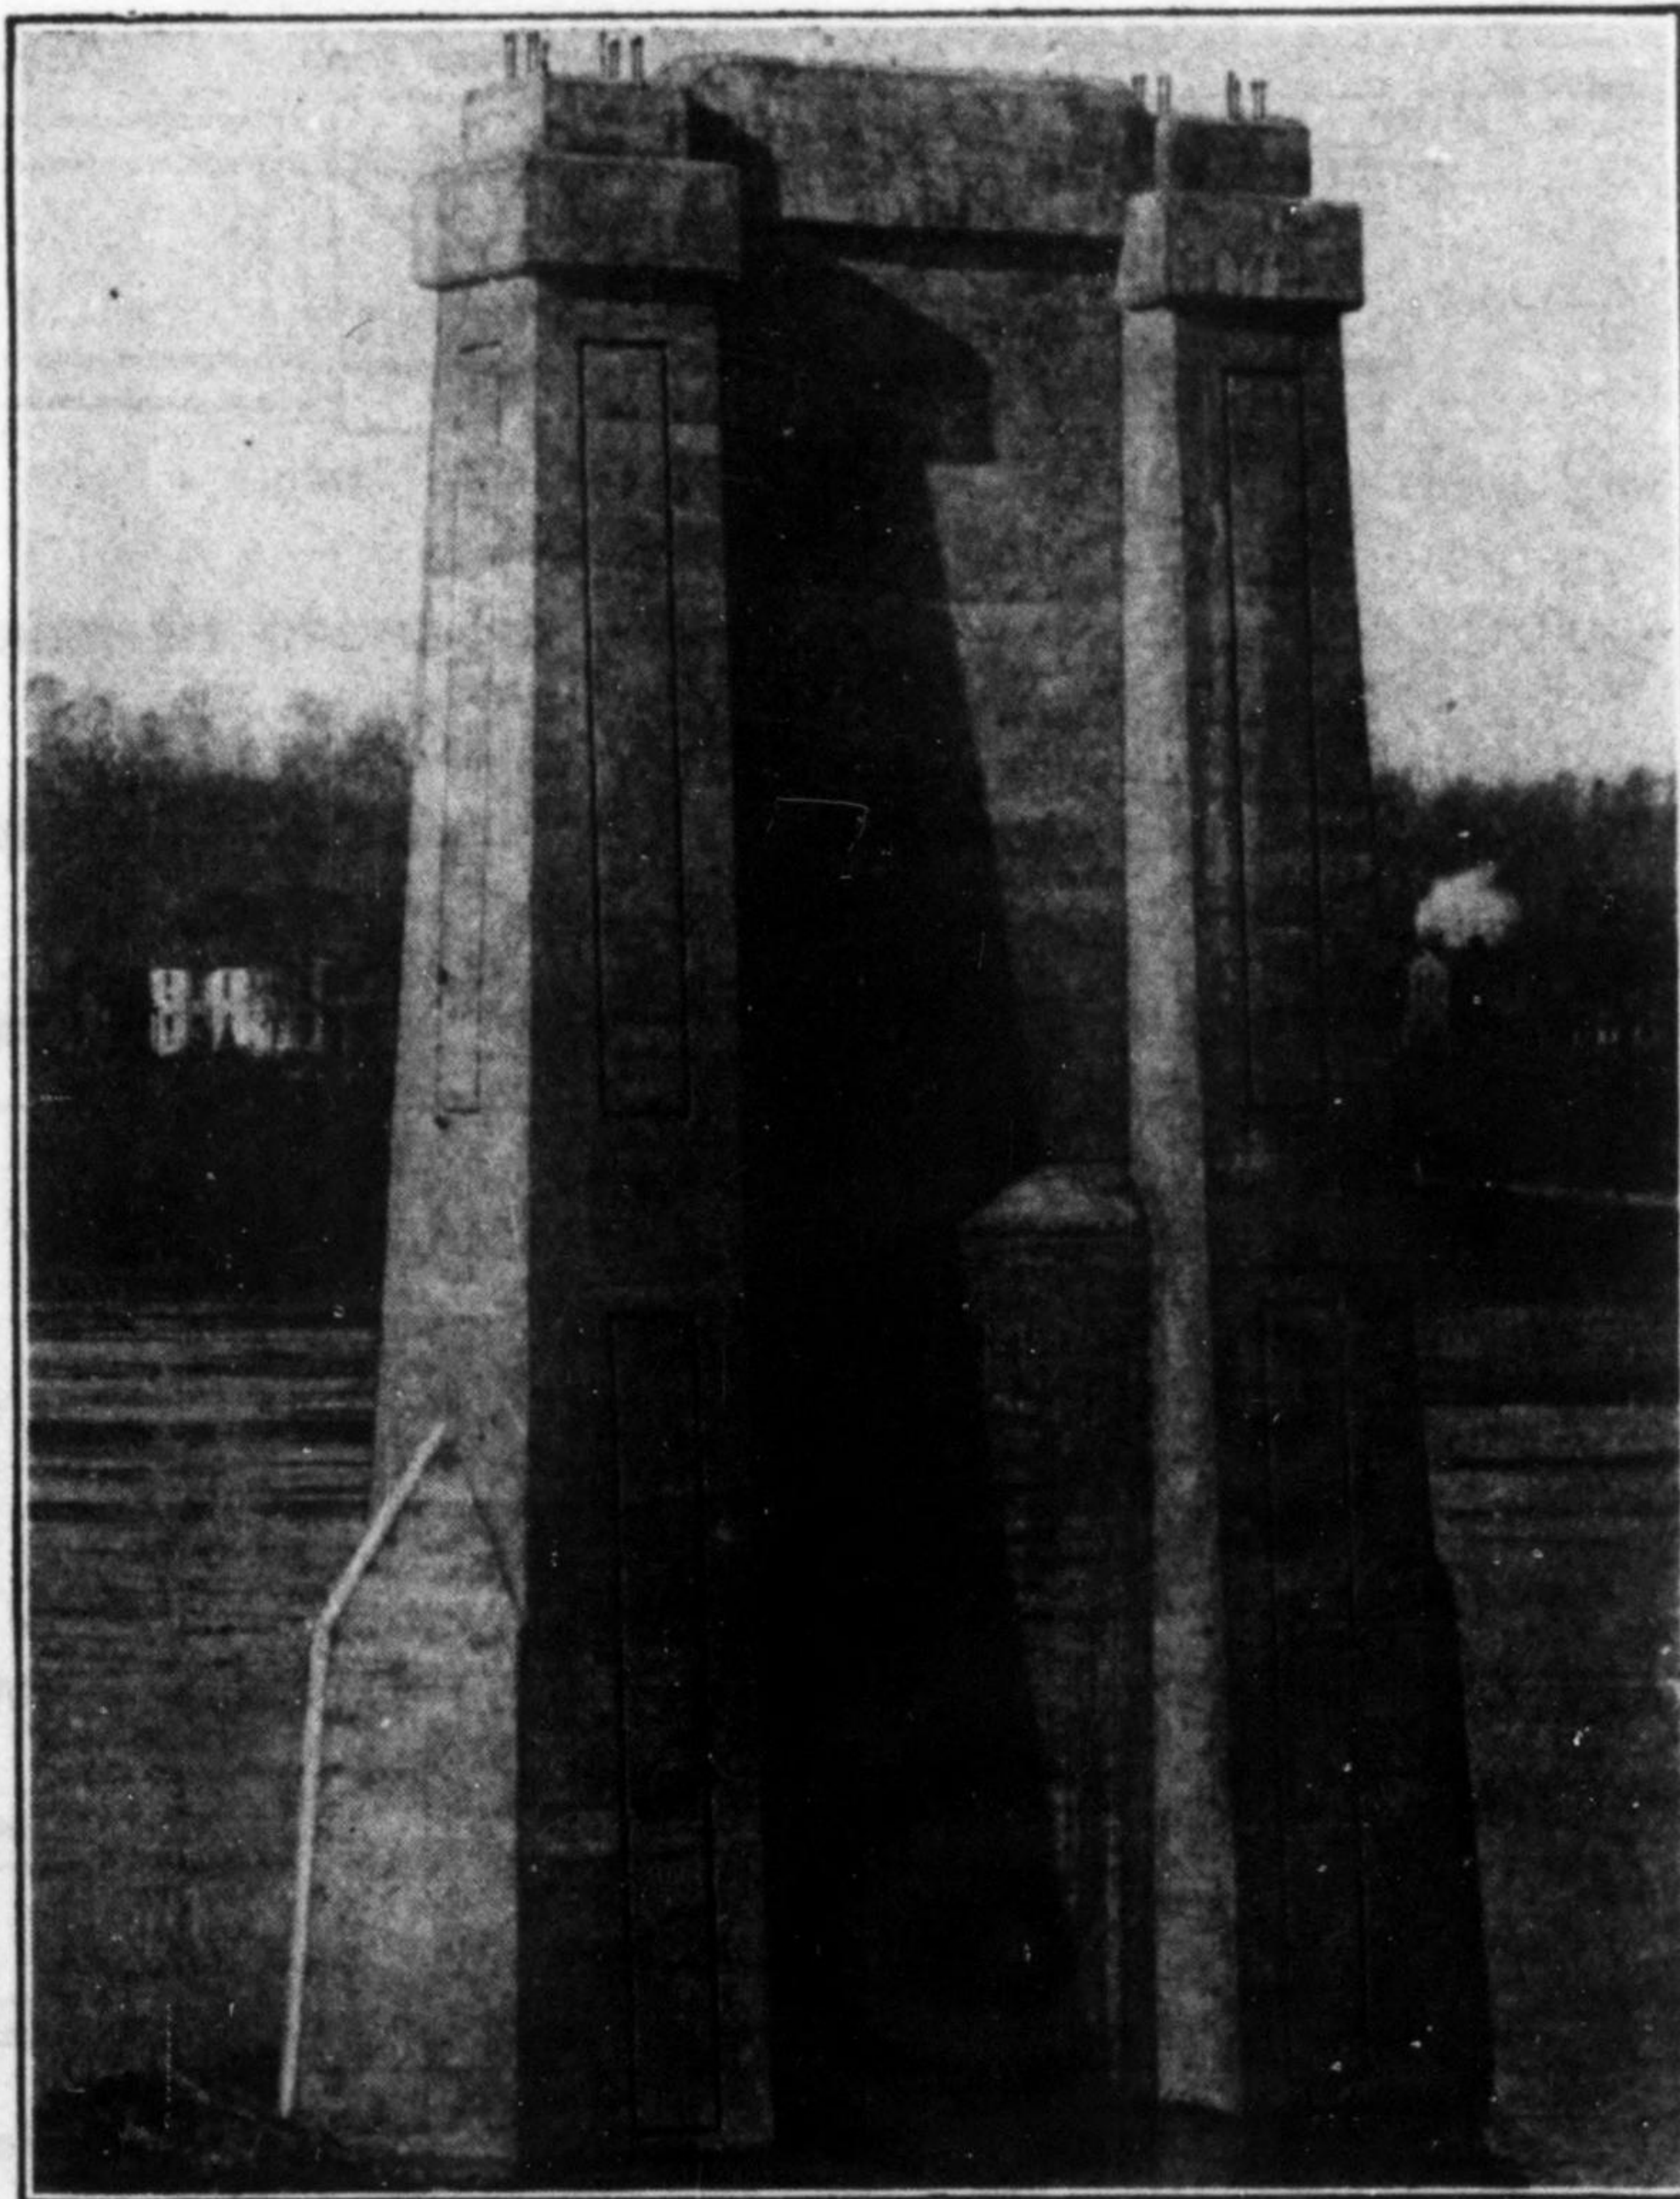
DUMBBELL PIER OF OHIO RIVER BRIDGE
